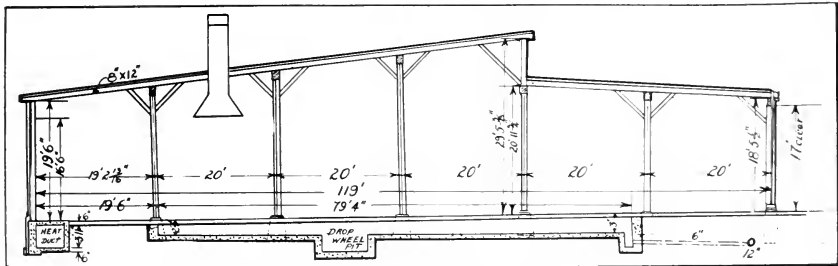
Cross section through drop wheel pit stall, Canadian National Railways, Locomotive House, Moncton, N.B.
